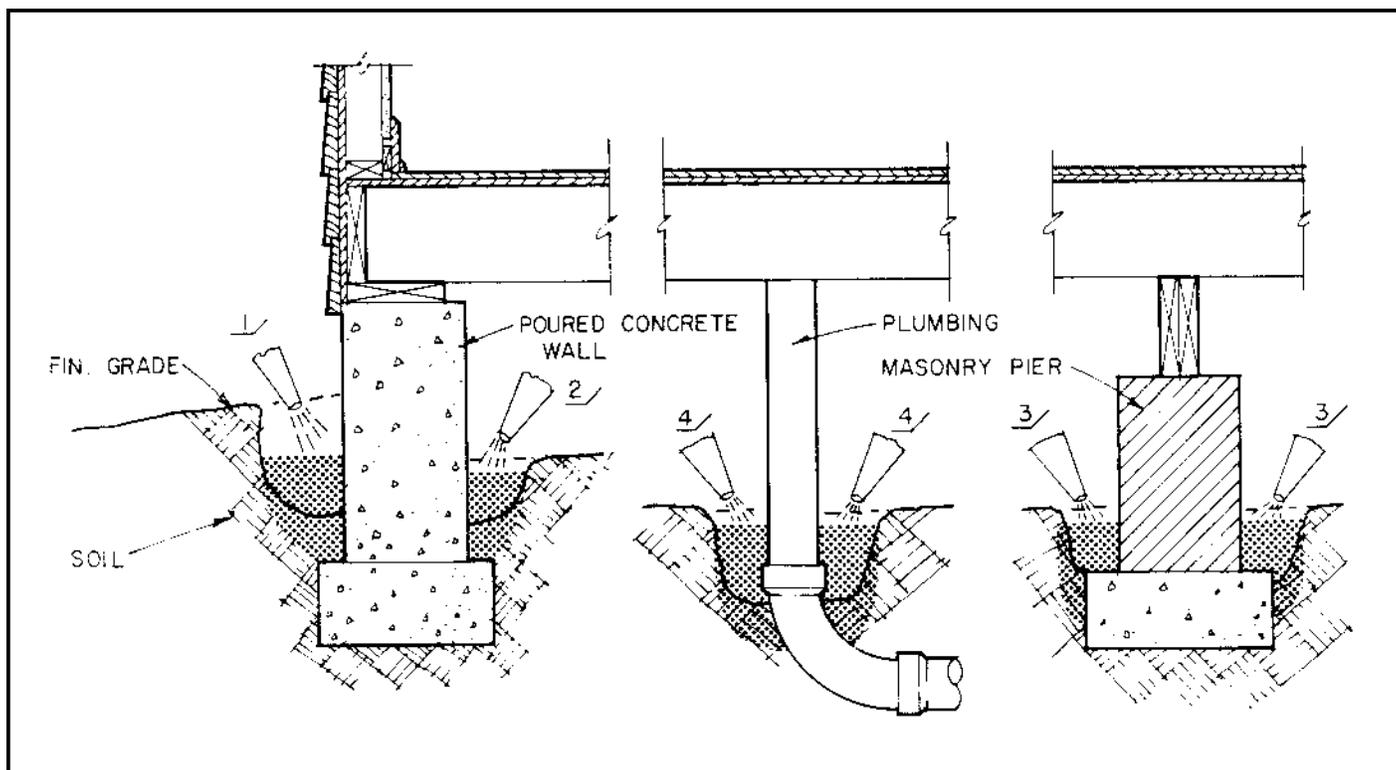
Application of chemical to crawl space construction. Soil treatment (1) along outside and (2) inside foundation wall; (3) around pier and (4) plumbing (adapted from USDA).
